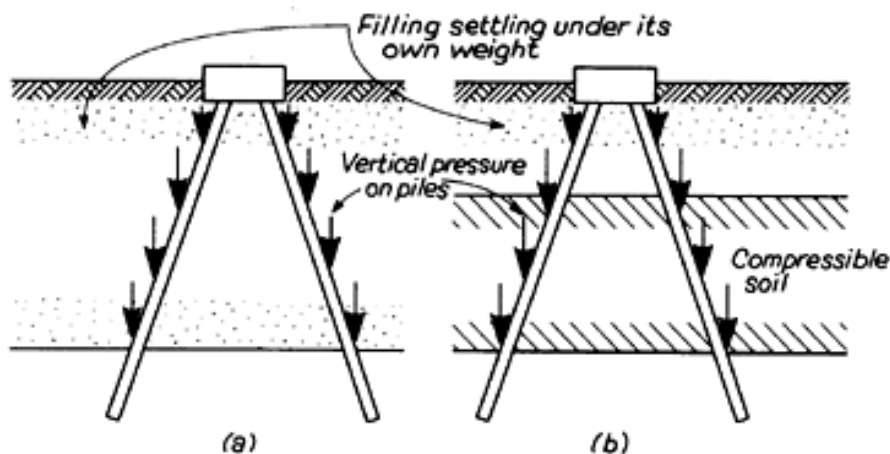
Bending of slender raking piles due to loading from soil subsidence: (a) Fill settling under own weight and (b) Fill overlying compressible soil
